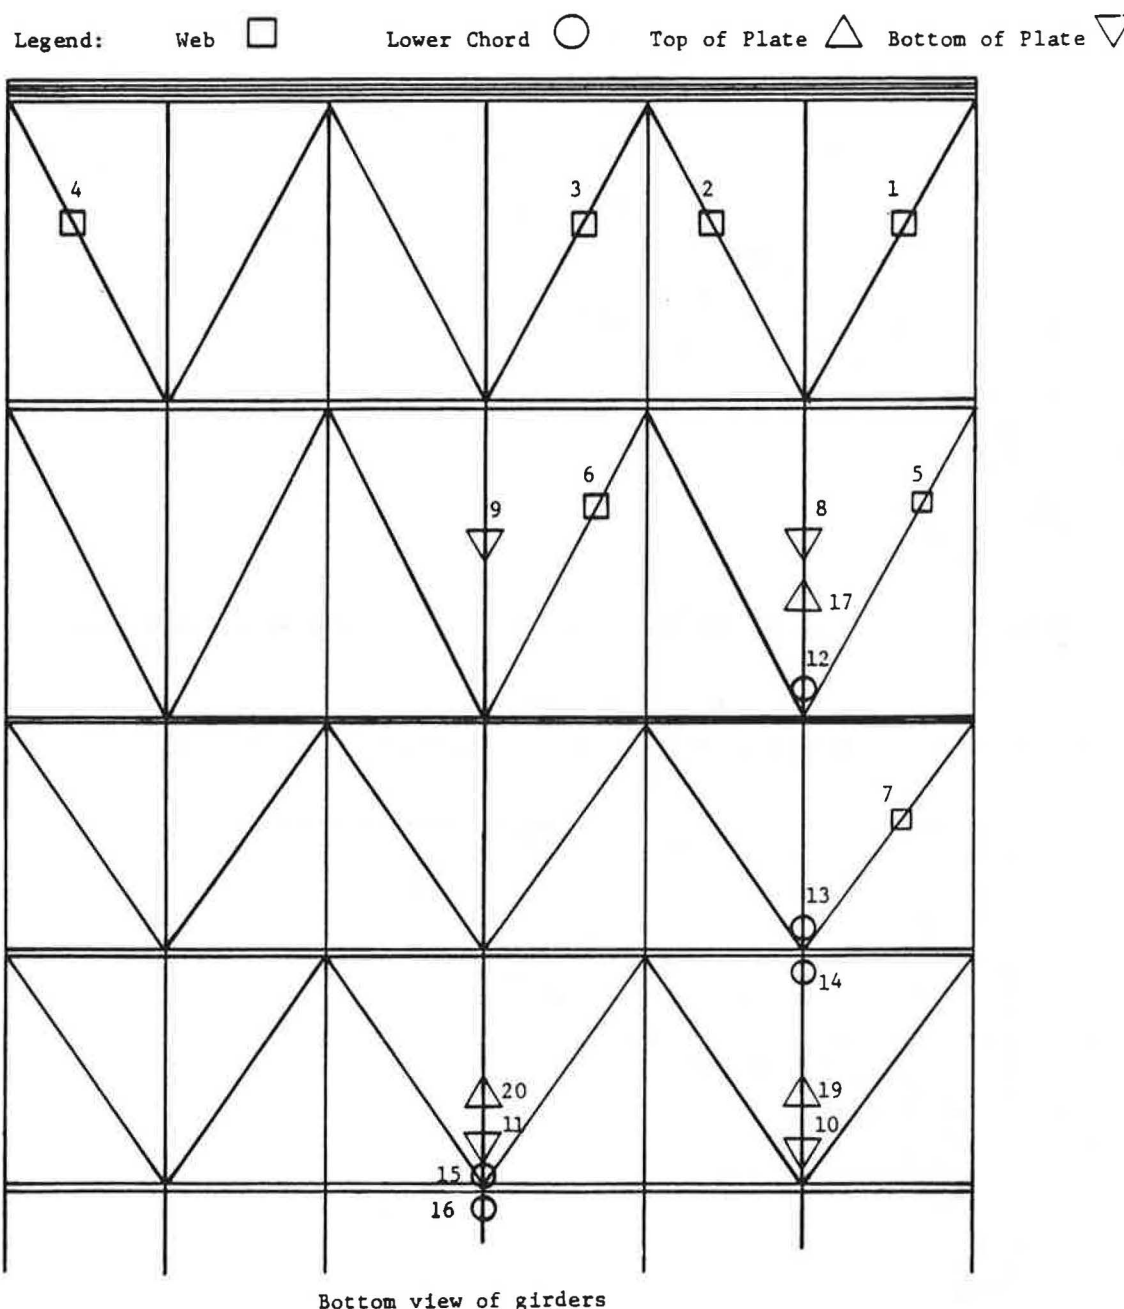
Location of electrical strain gauges bonded to elements of the bridge superstructure.
